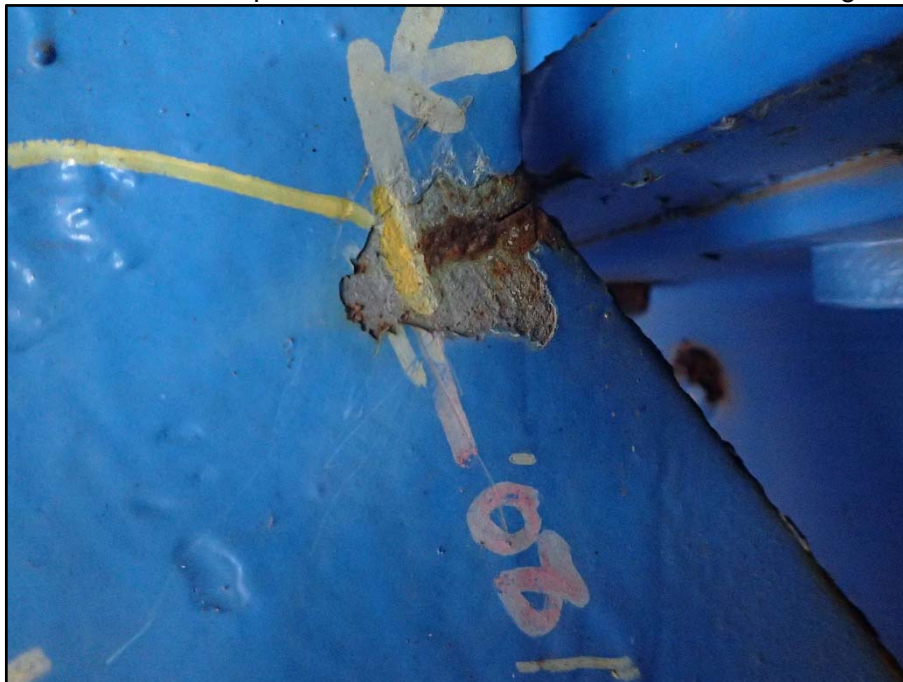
Unit III, Bent 9, North column; 3/4" L crack in gusset coping from upper cross bracing to column
